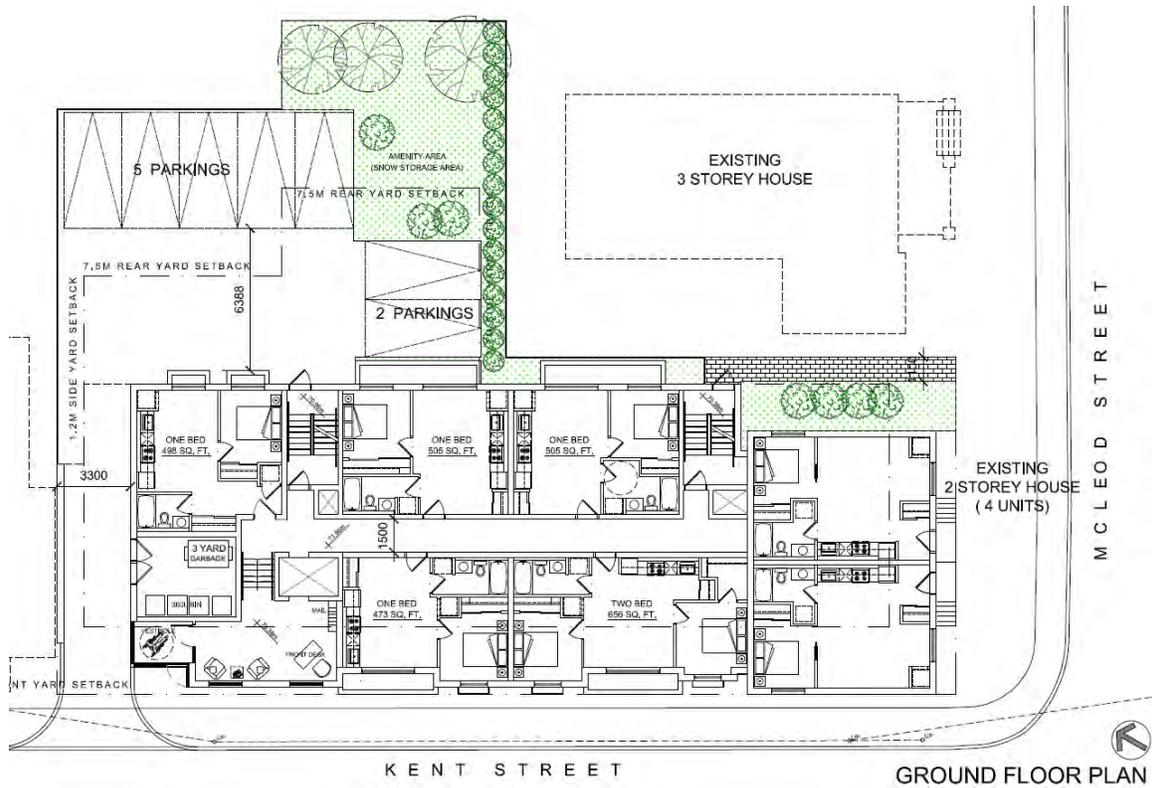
Ground floor plan of the proposed development. Note 7 exterior parking spaces, outdoor green space, and retention of the original property set-backs along Kent Street. (Roderick Lahey Architect Inc.)
